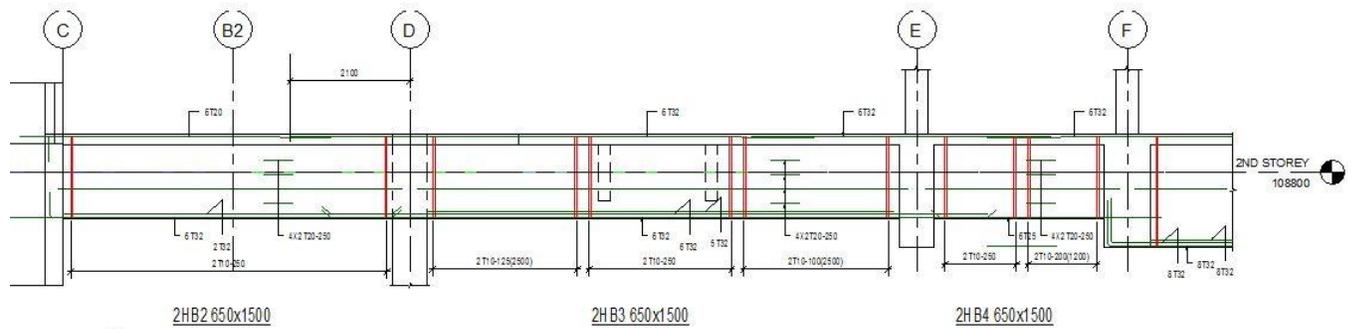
Structural Beam Detail (Image courtesy of LSW)
